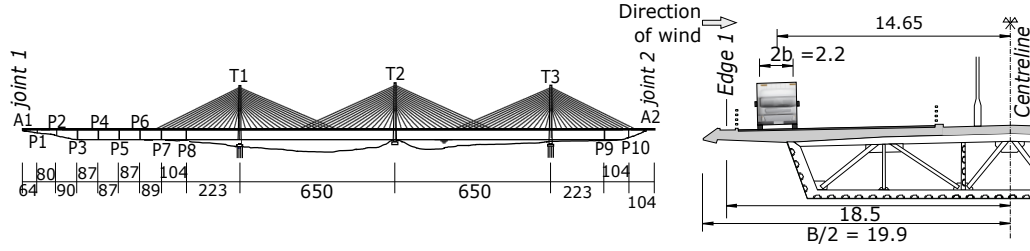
Elevation and deck cross-section of the Queensferry Bridge without wind barriers. Units in meters.
